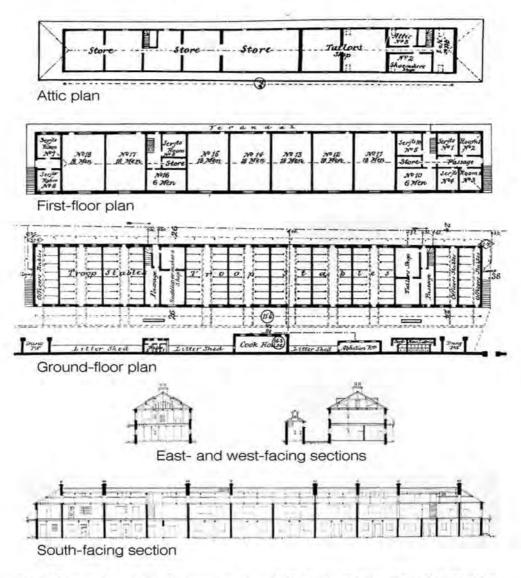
Plans and sections of the western barrack block, dated 1901 (TNA: WO 78/3098).
